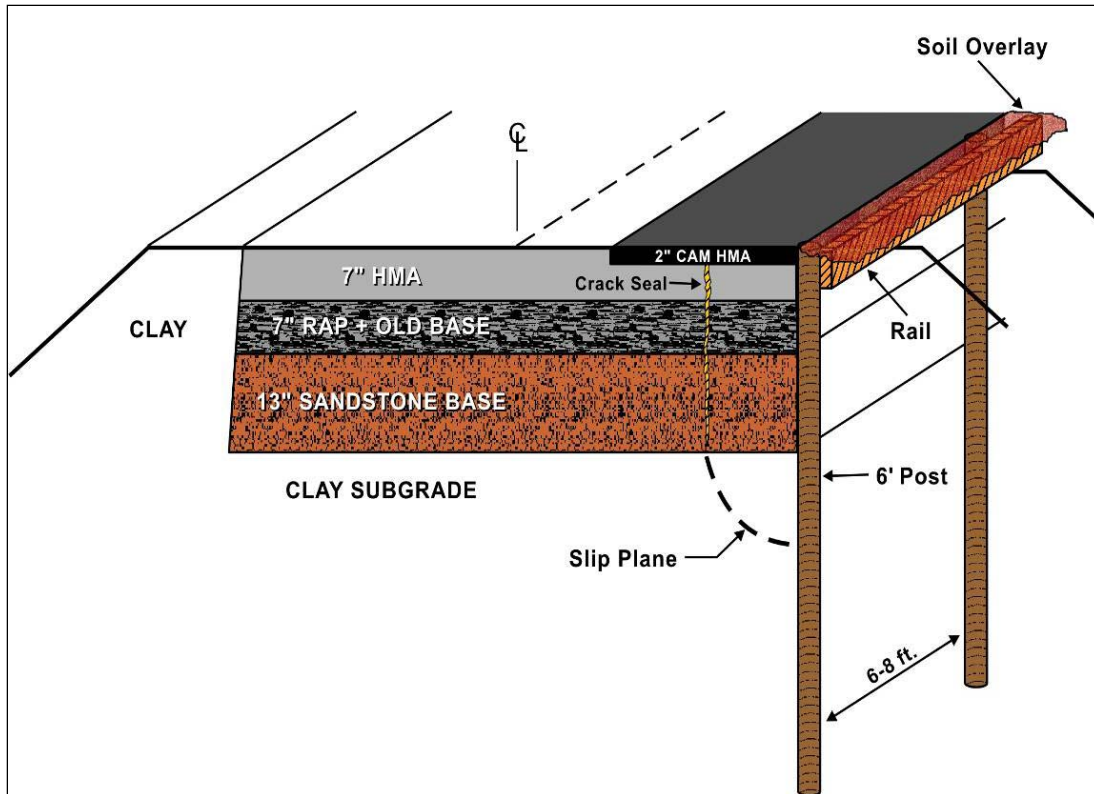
Adding Edge Support with Guardrail Reinforcement.
